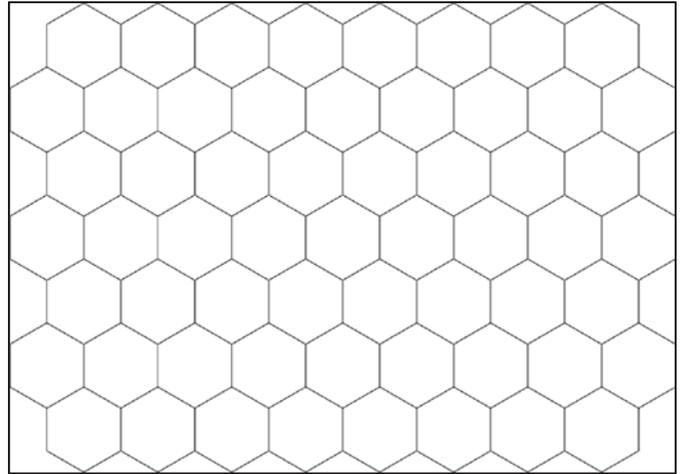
Geometric pattern for precast concrete panels using the tessellation concept.
